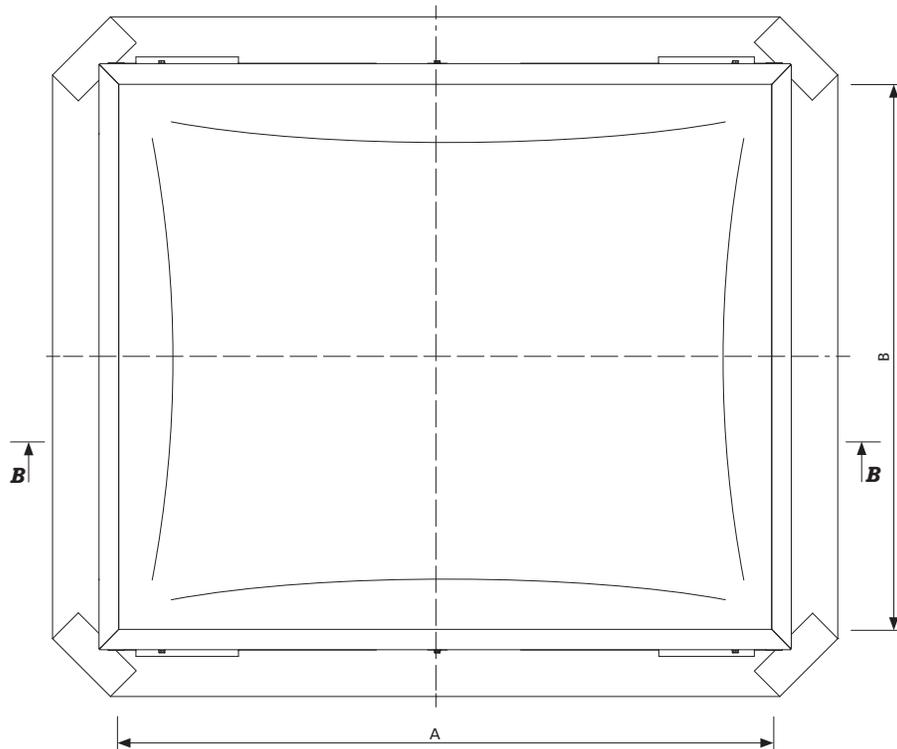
Top view of mcr PROLIGHT NG-A fixed skylight, dimensions in mm
